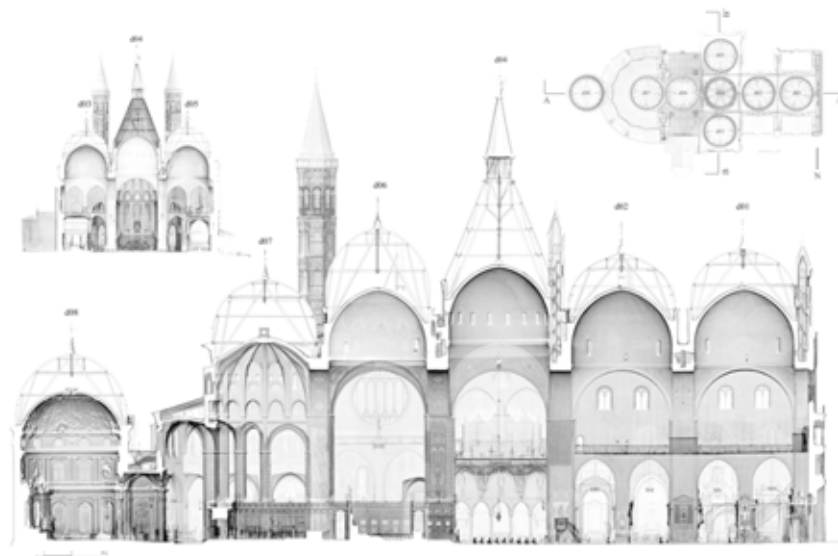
St Anthony Basilica: southern longitudinal section and eastern cross section (drawing L. Vandenabeele, author).
